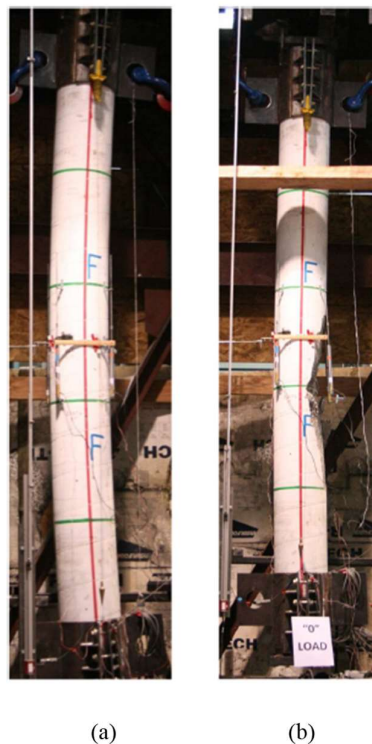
Slender Columns Tested to Failure (102-mm eccentricity): (a) Before Failure; (b) After Failure.
